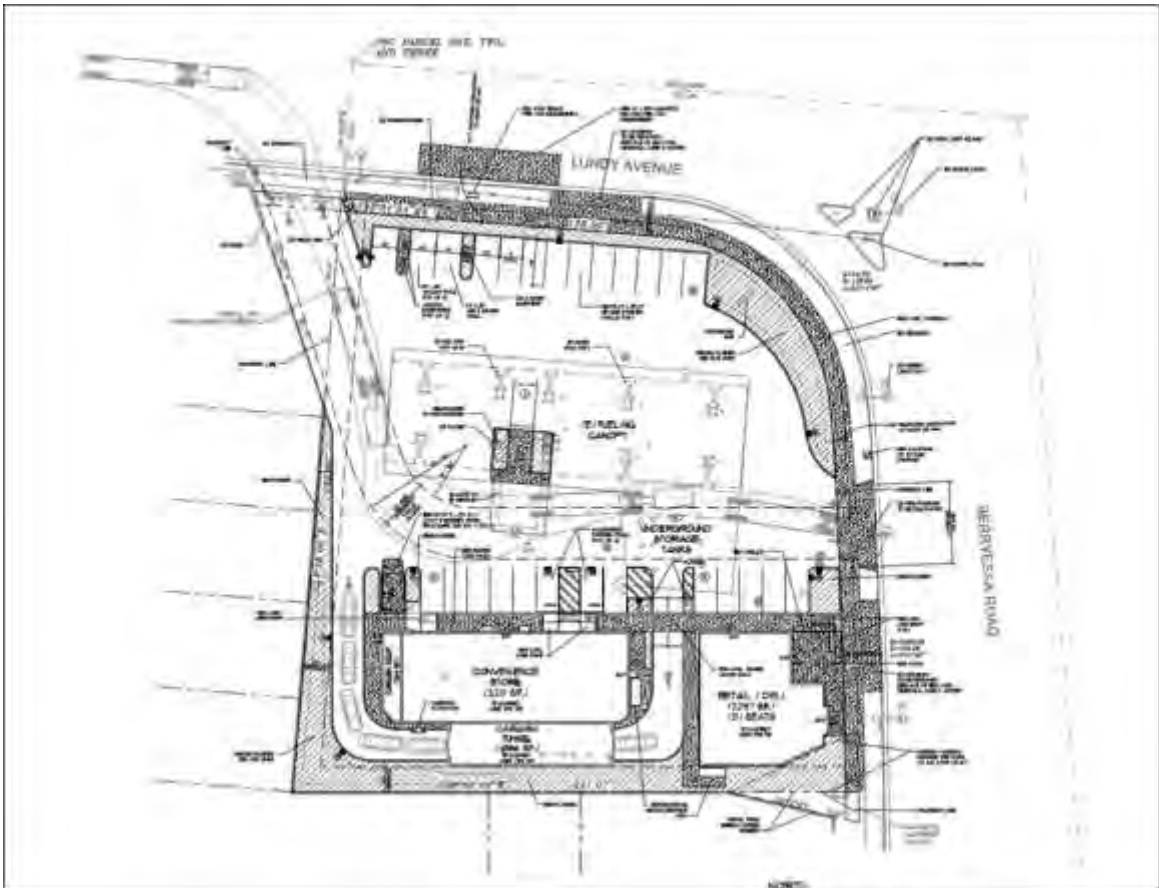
Conceptual Site Plan (larger plan set attached to Staff Report)
